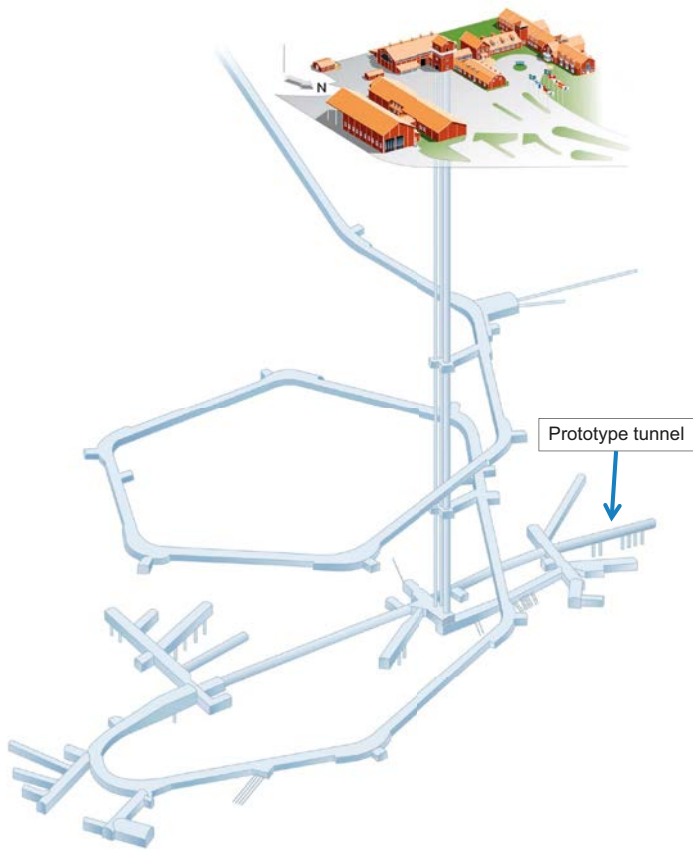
Tunnel system at Äspö HRL. The prototype repository is located after section 3/500 m at the end of the tunnel system.
